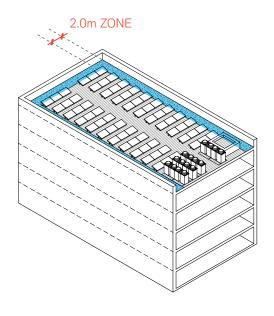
ROOFTOP PLANT ZONE SET BACK
